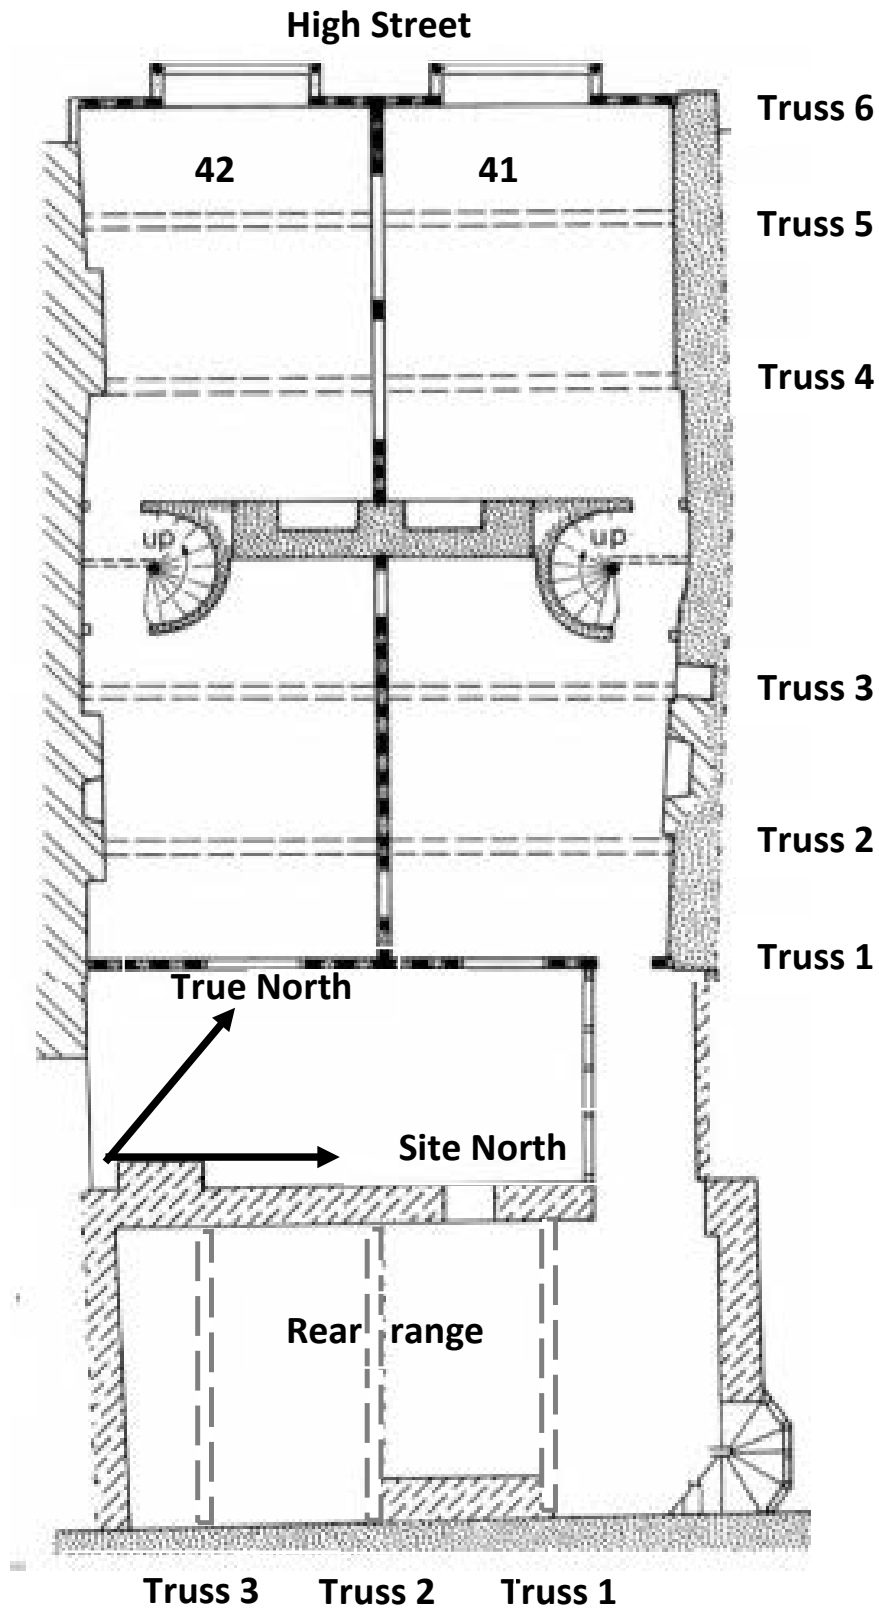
Outline plan of 41/42 High Street to show position of the roof trusses (after John Thorp)
